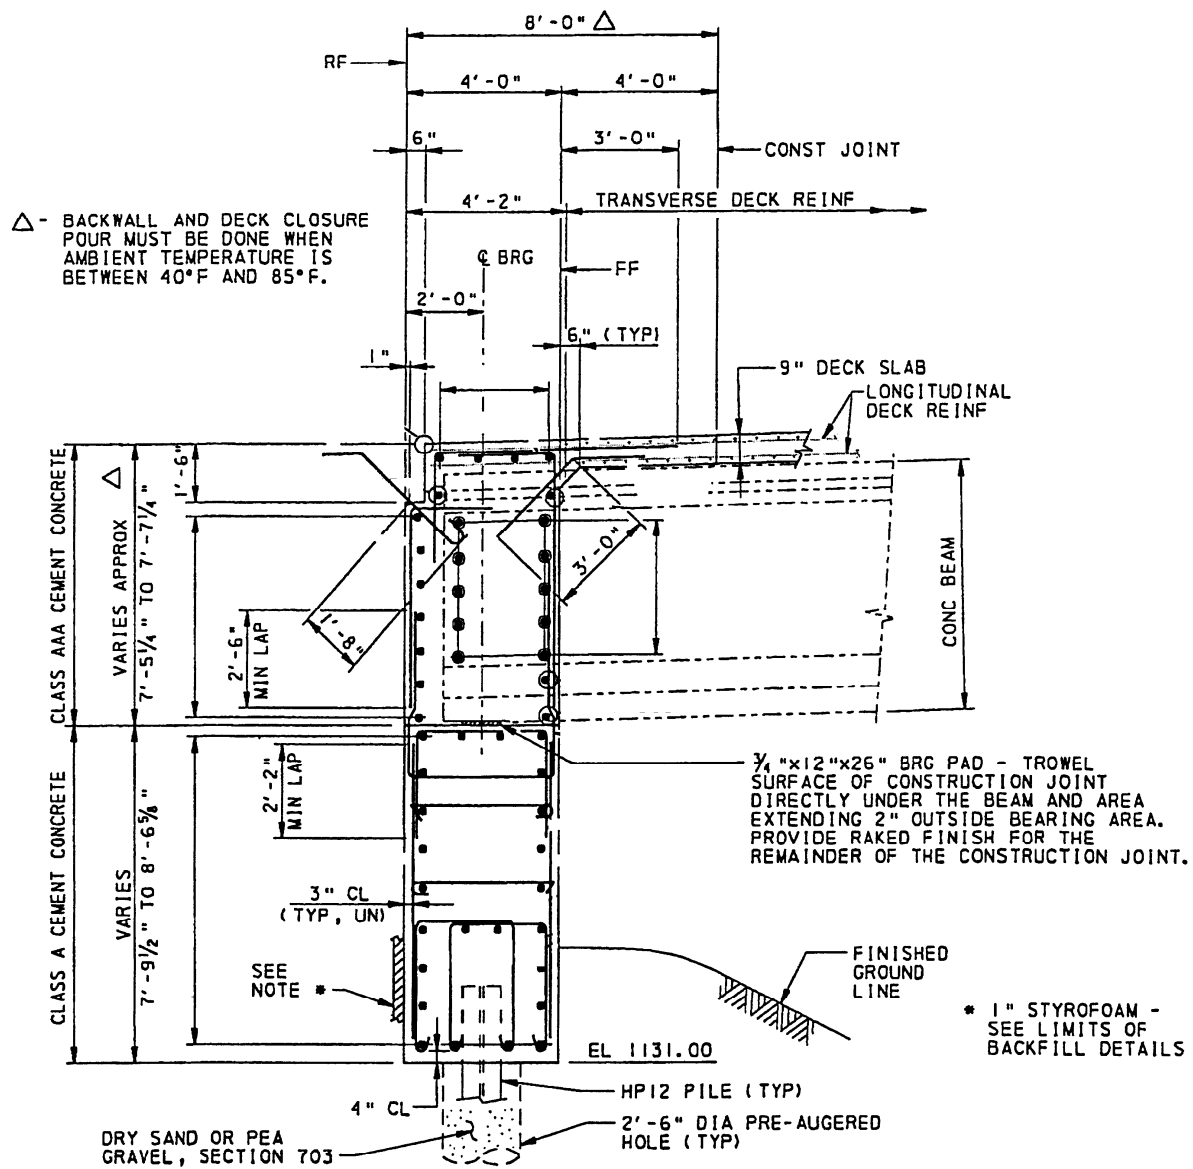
Cross-Section of Bridge 211 Abutment 1.
